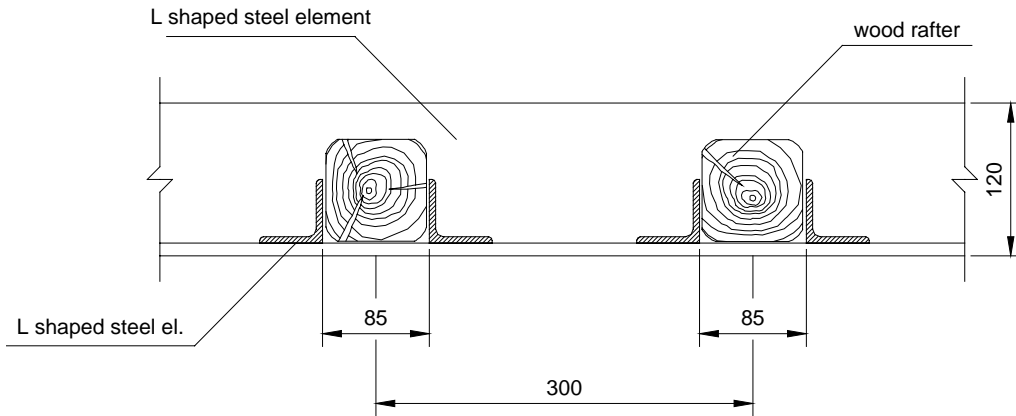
Rafter anchorage to steel frame (dimensions in mm).
